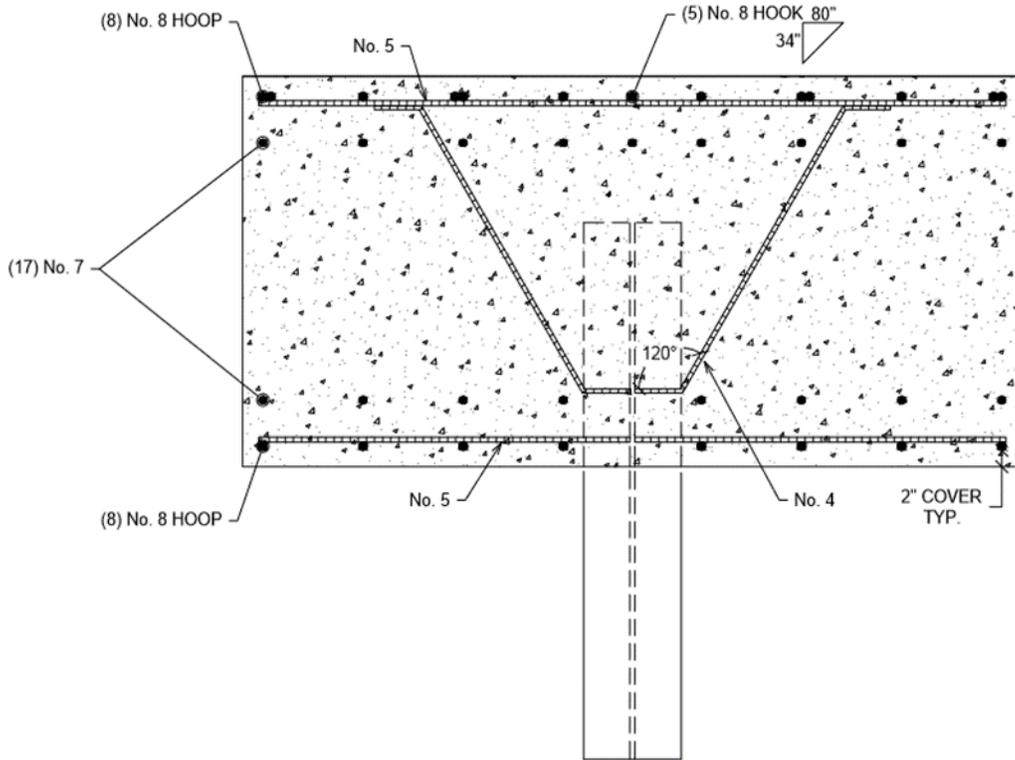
Plan view of UHPC joint specimen showing locations of connection bars
